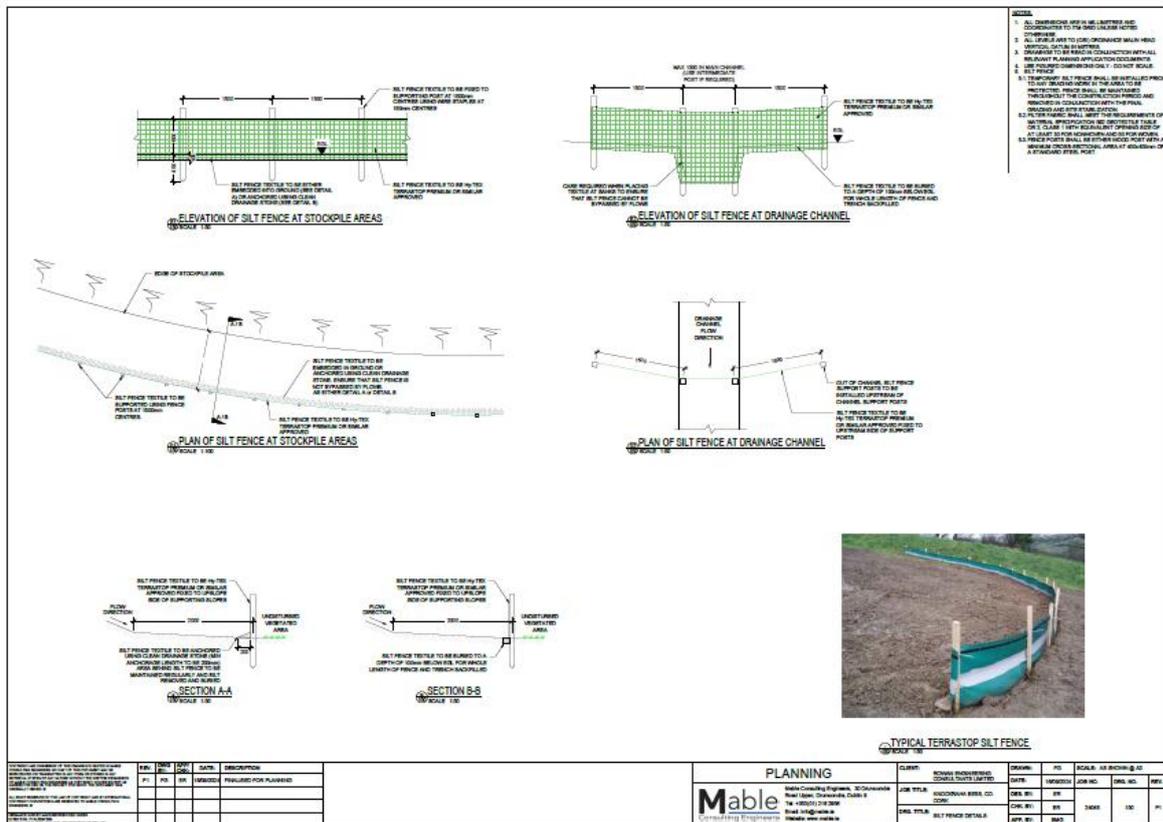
Silt Fence Detail (Drawing ref. no. 24045-150)
